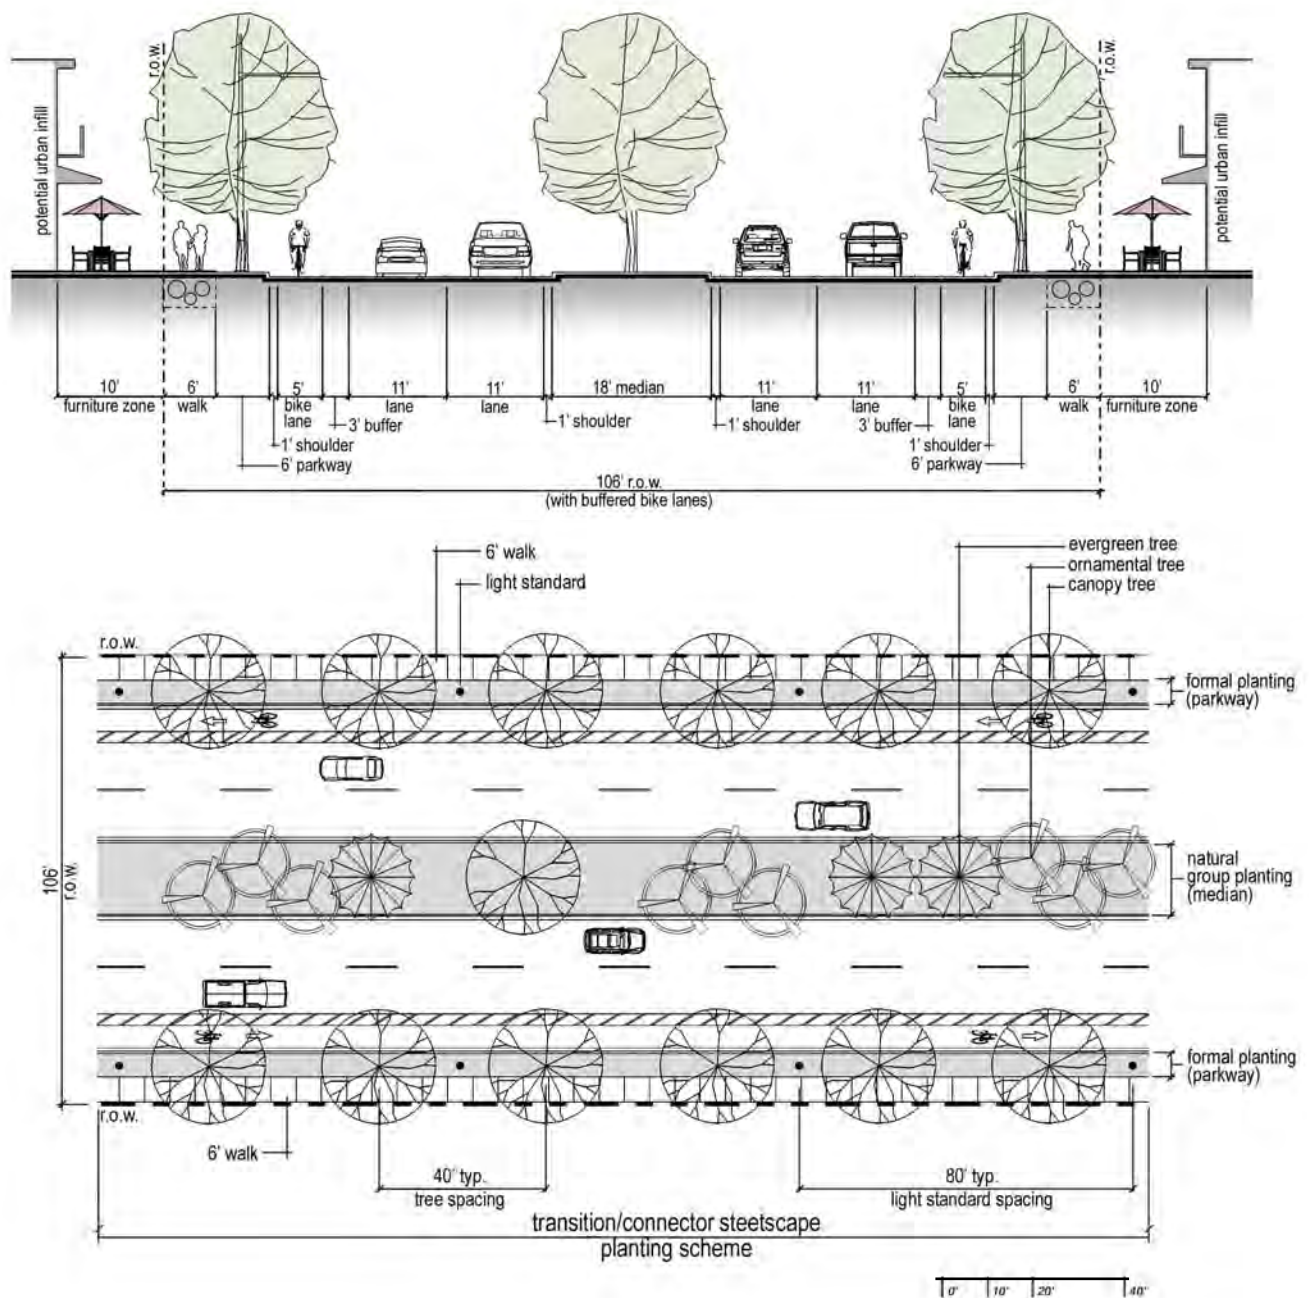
Typical Transition Arterial Section & Plan: Minor Arterial
